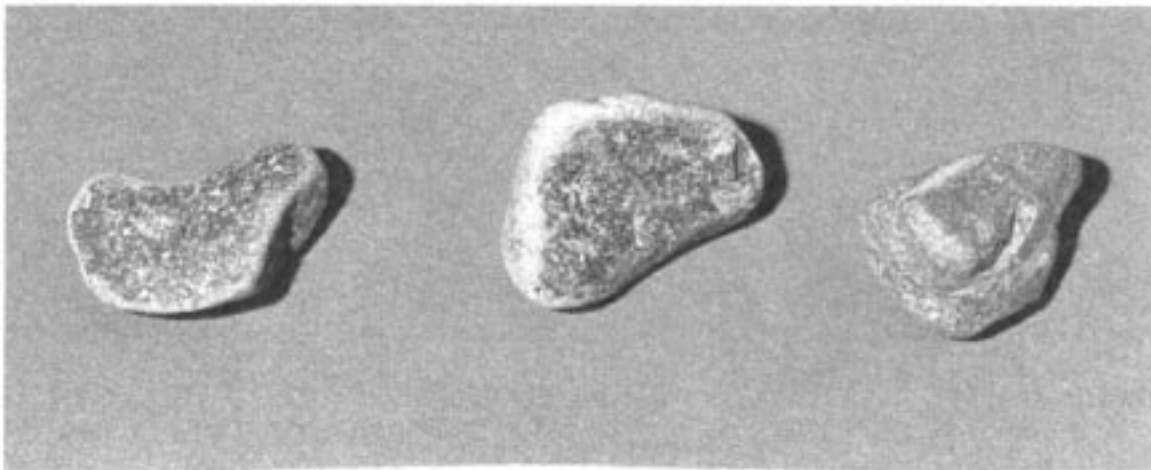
Non-Fractured Particle (Round Edges, Smooth Surfaces)
